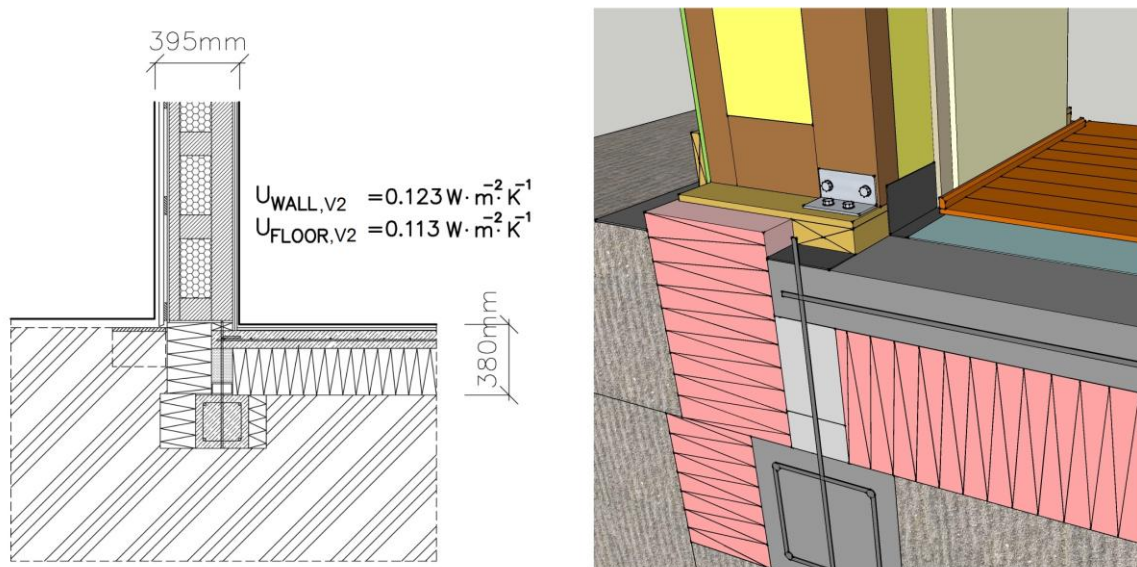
The wall and floor construction of diffusion opened wooden structure [author]
